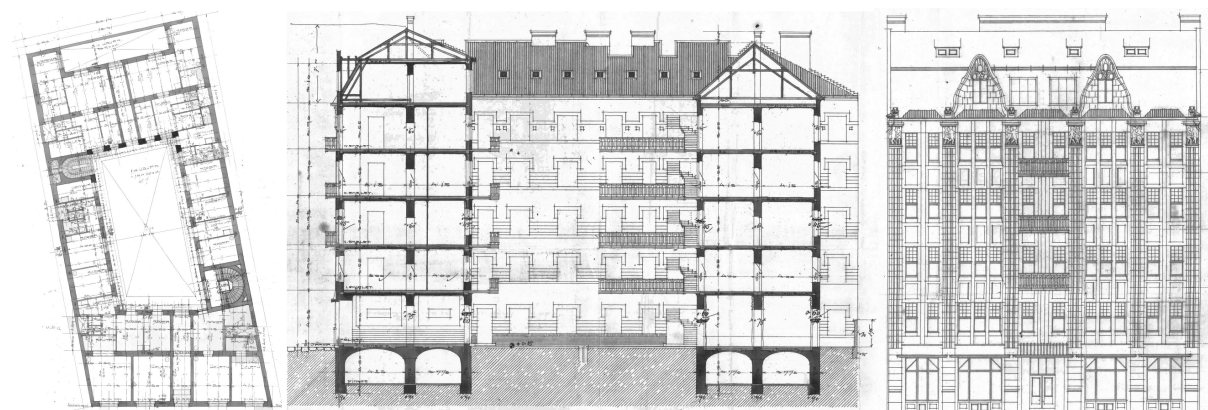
Site plan, section and elevation of the examined building (1912, source Budapest Archives)
